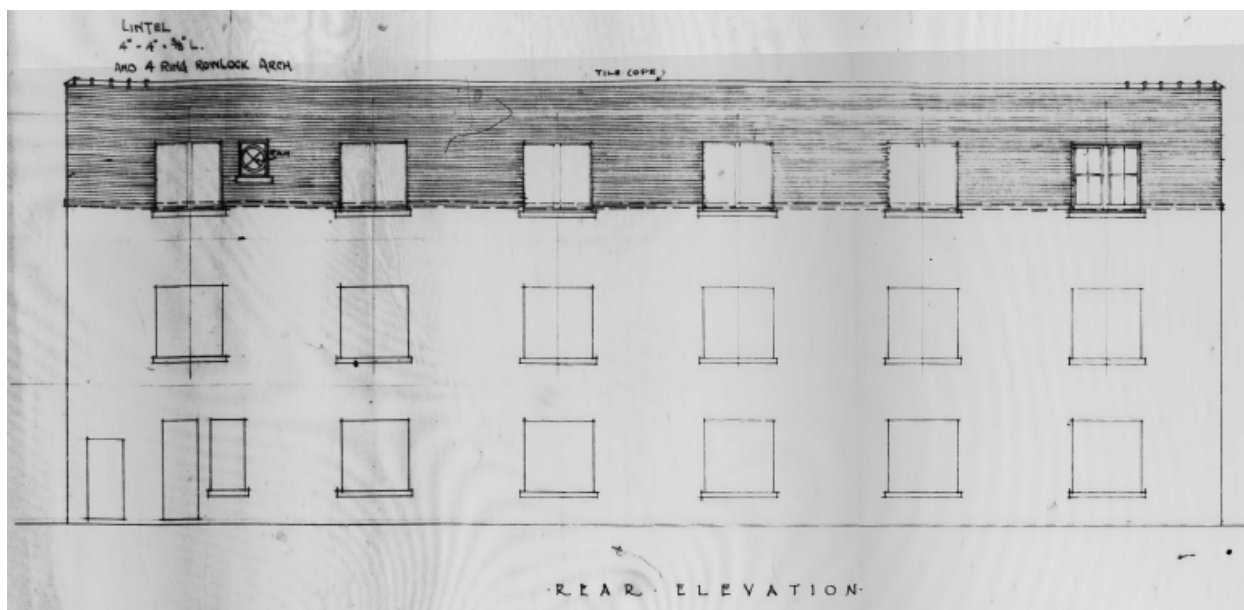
1925 rear (south) elevation drawing of 1497 Queen Street West by Chapman and Oxley Architects showing third storey addition (Building Records).
